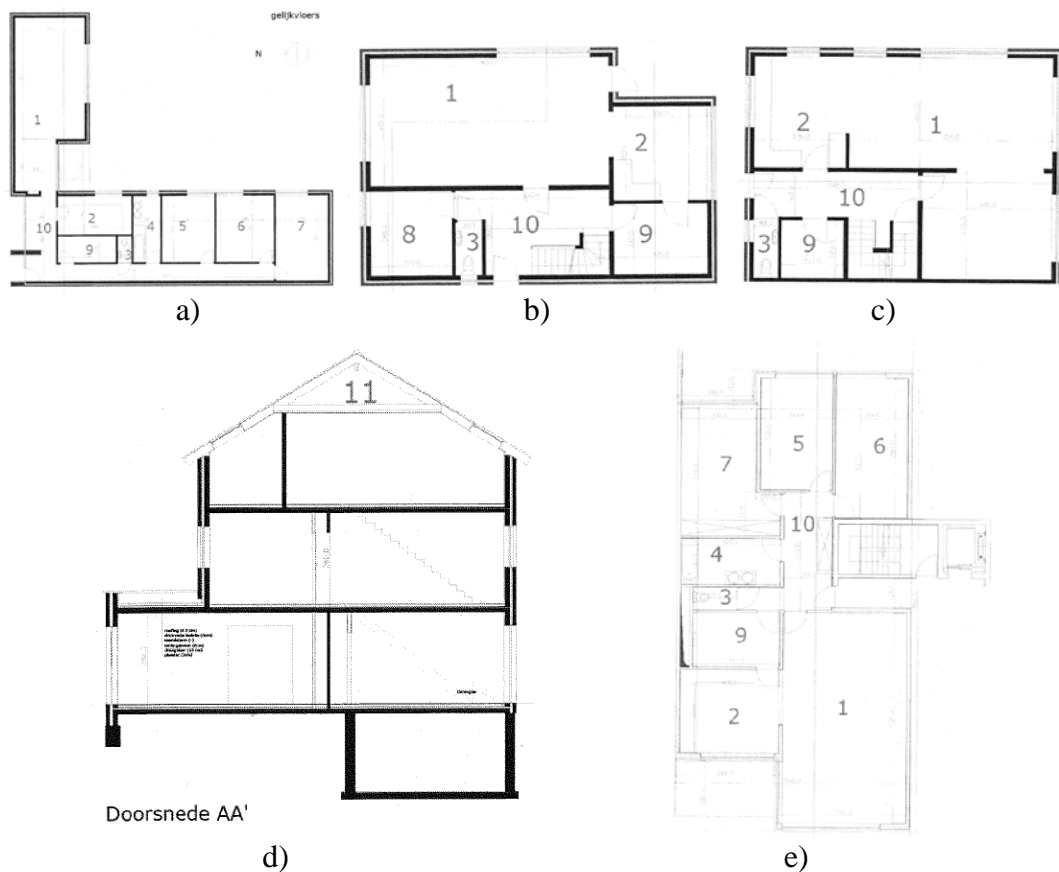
Used typologies: a) architectural villa, b) detached house, c) semi-detached house (plan), d) terraced house (section) and e) apartment (plan)
